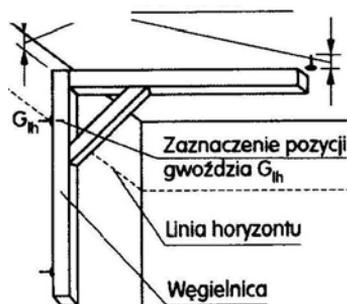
Establishing of the plaster coat face on the ceiling using an angle gauge [2].
